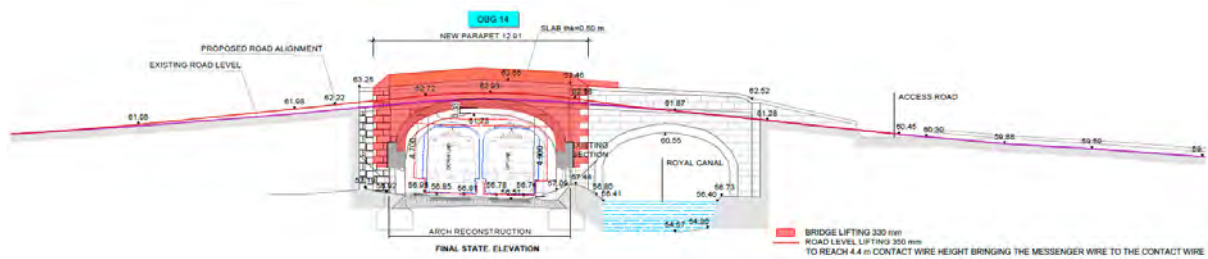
Deck reconstruction of OBG14 - Elevation
